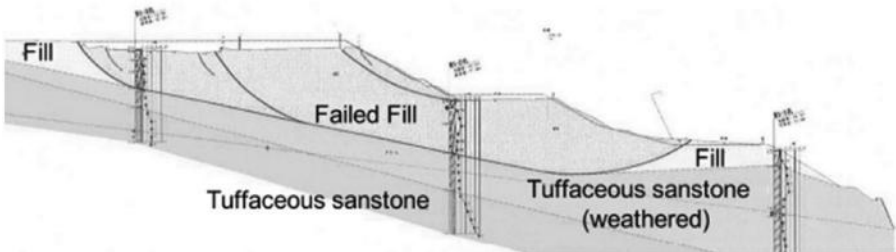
Cross-sectional profile of failed slope in Block 1-1.
